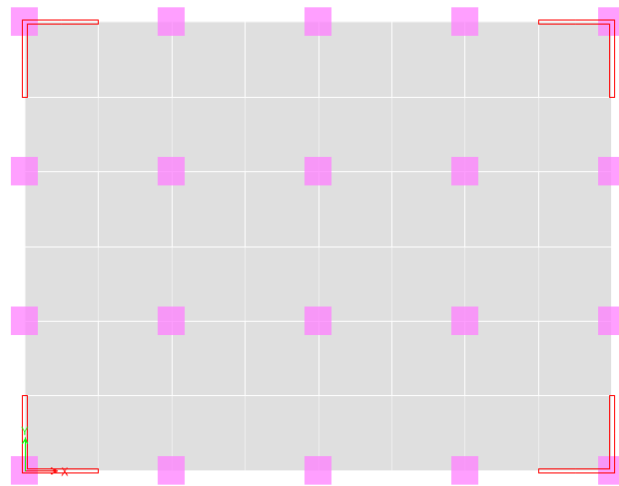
2D plan of 8th story rectangular shape building case SW3
